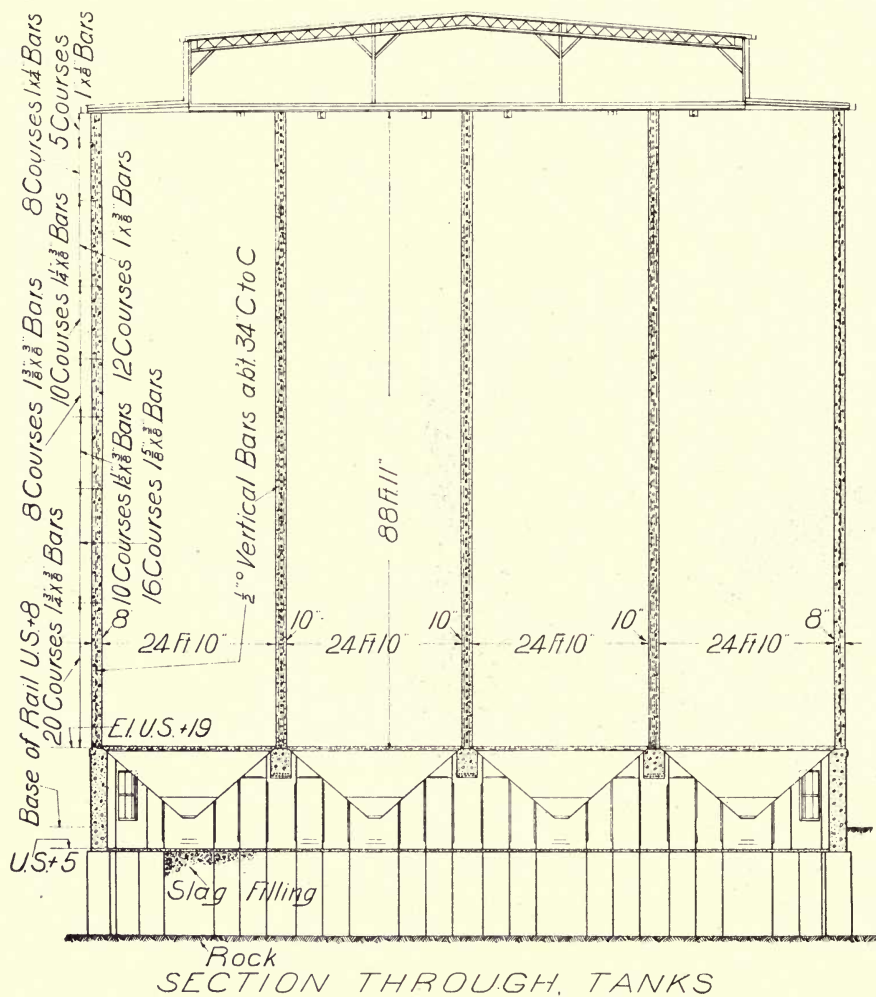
CROSS SECTION OF TYPICAL REINFORCED CONCRETE GRAIN ELEVATOR.
